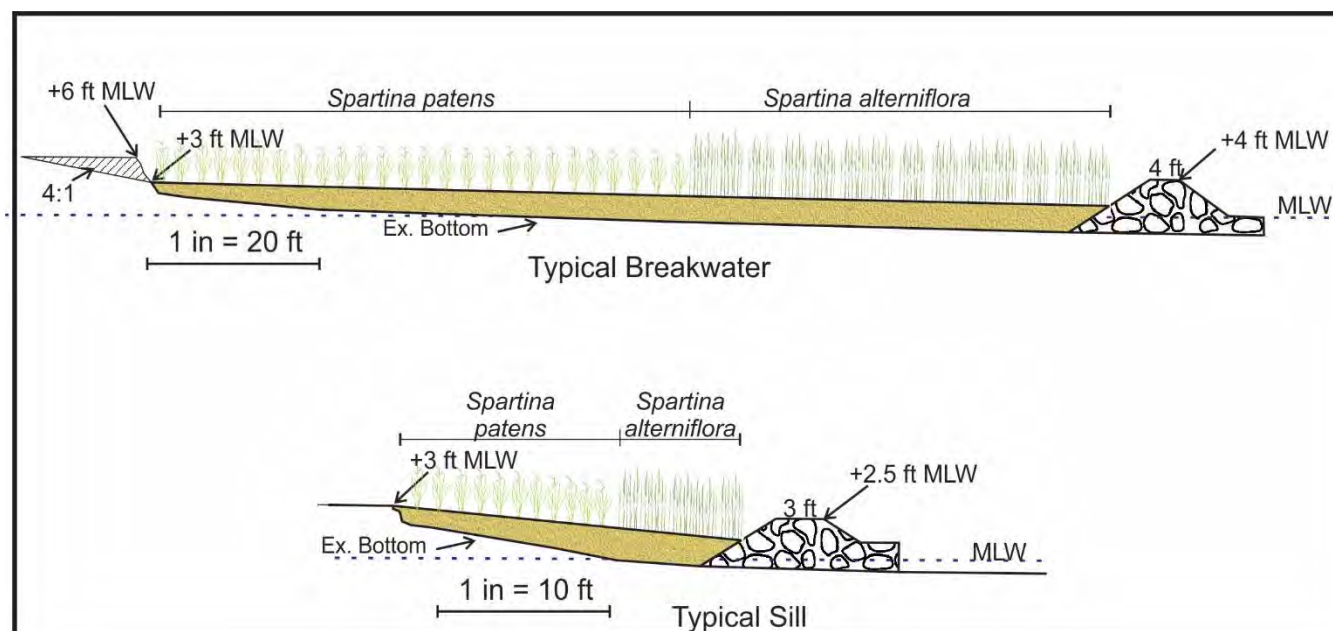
Typical cross-sections for the picnic area at Belle Isle.
